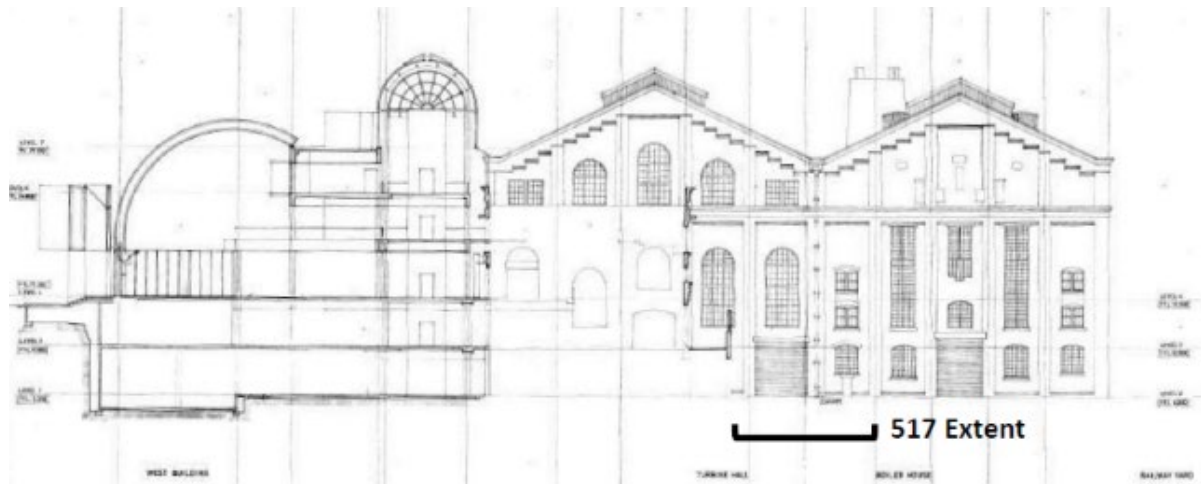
1984 MAAS Stage 2 Construction plan. Section 11 faces south and illustrates the basements beneath the Wran Building, the Turbine Hall and the Boiler House (left to right).
